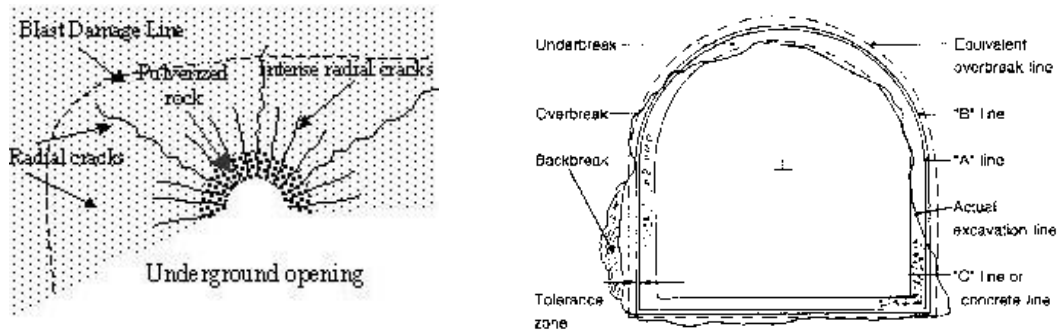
Mechanisms of blast damage to rock around an underground opening cross-section, with EDZ at left and breakage at right
